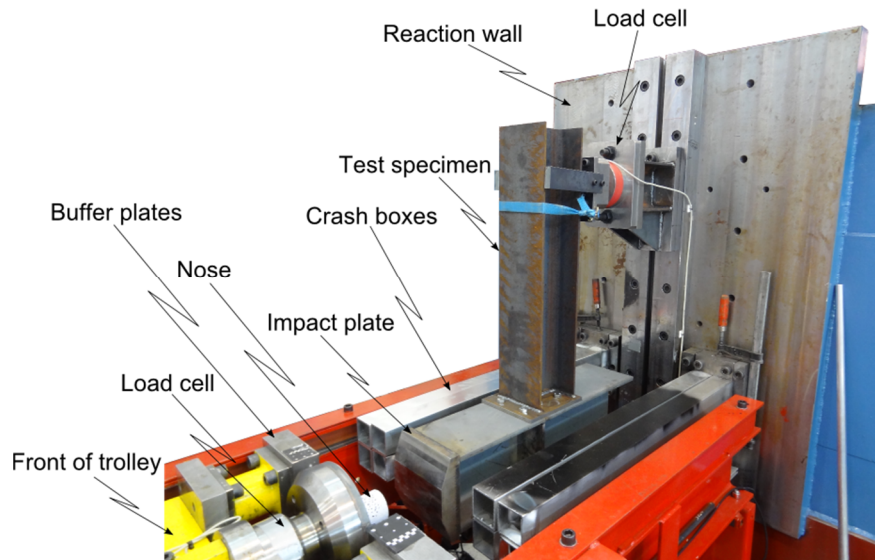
Detailed view of attachment of the test specimen to the dynamic test rig.
